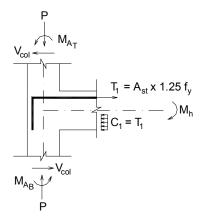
and 6.8 shows the development of forces in the joint due to beam reinforcement, for sway to right and left, respectively.
